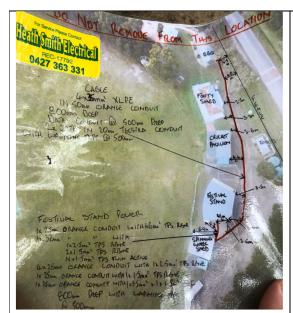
Recently installed electrical & comms infrastructure reticulation on site
